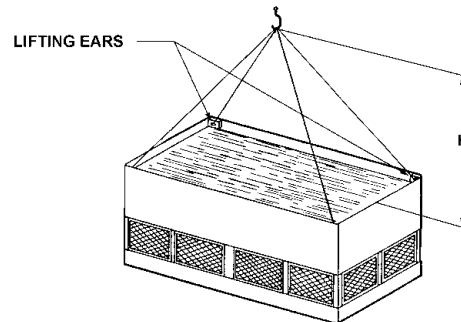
Bottom Section, UBT 8-56B through UBT 8-912B.
